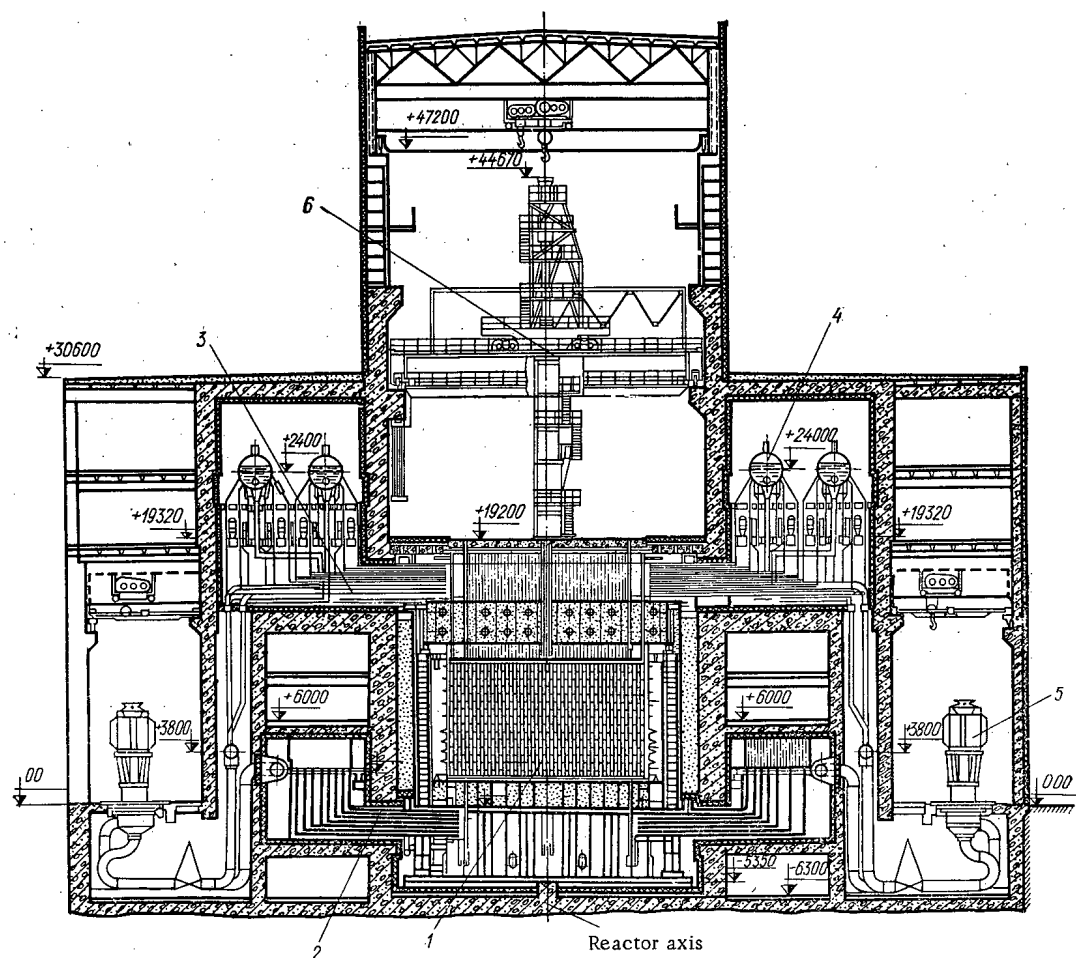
Section through reactor and multiple circulation loop: 1) core; 2) water supply lines; 3) steam-water mixture bleed lines; 4) steam separator; 5) pump; 6) refueling machine.
